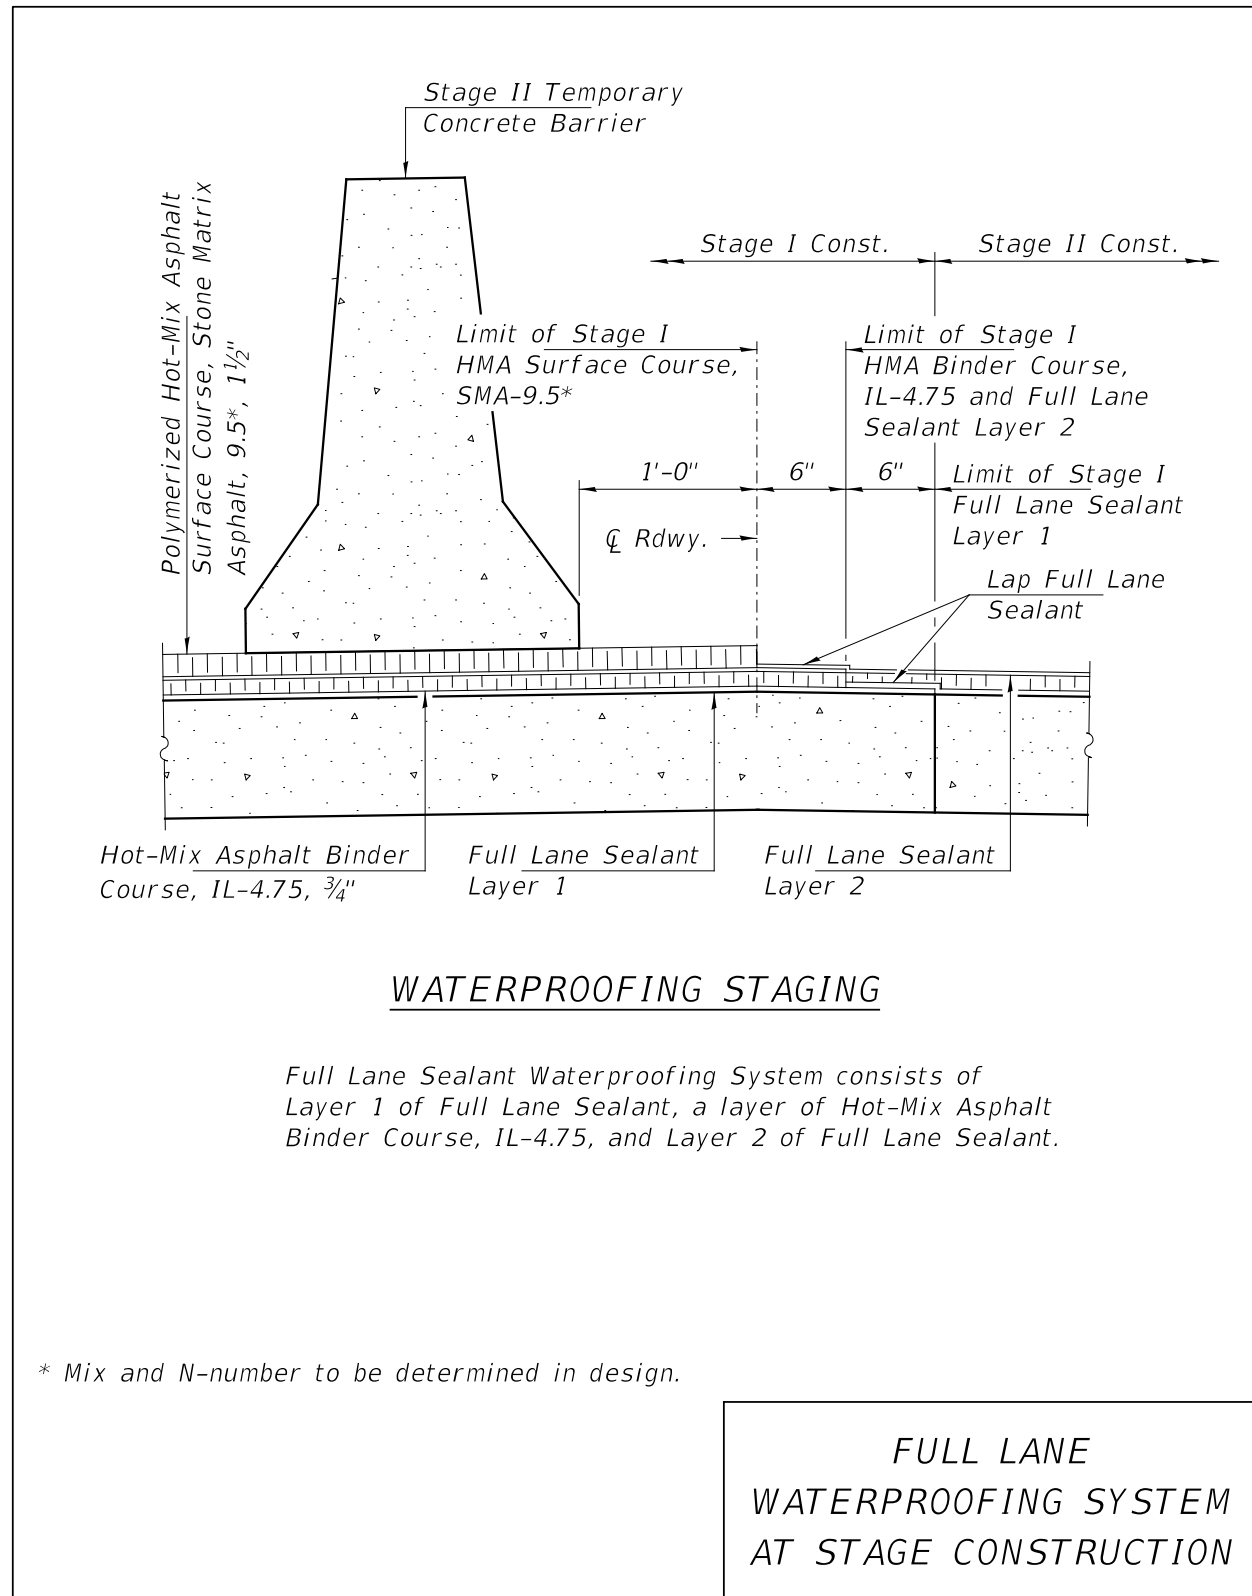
Full-Lane Waterproofing System at Stage Construction
